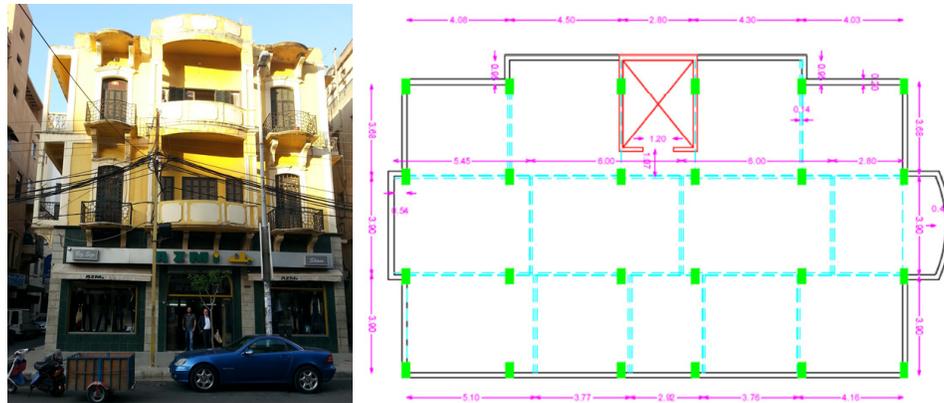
The main façade of the building and the layout plan showing the columns and the partitions.
